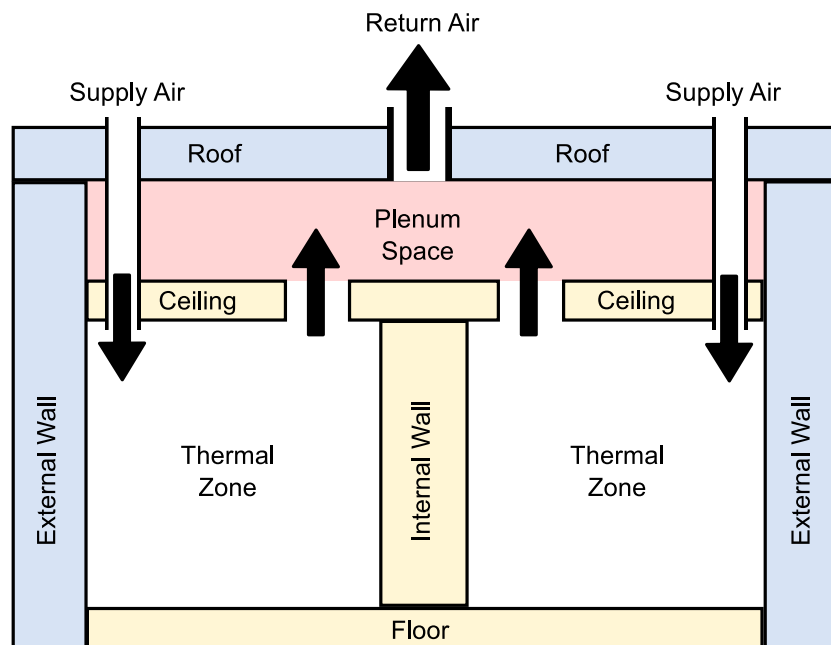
Sample building model. Internal building elements (e.g. internal walls, ceilings, etc.) are shown in light yellow, external building elements (i.e. external walls, roofs) are shown in blue, conditioned thermal zones are shown in white, and plenum spaces are shown in red. Black arrows indicate air flow for the ventilation system.
